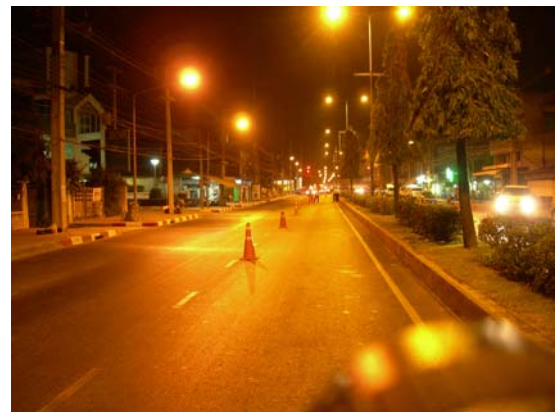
Test site for HPS 150W road lighting for C2 class with R3 road surface
